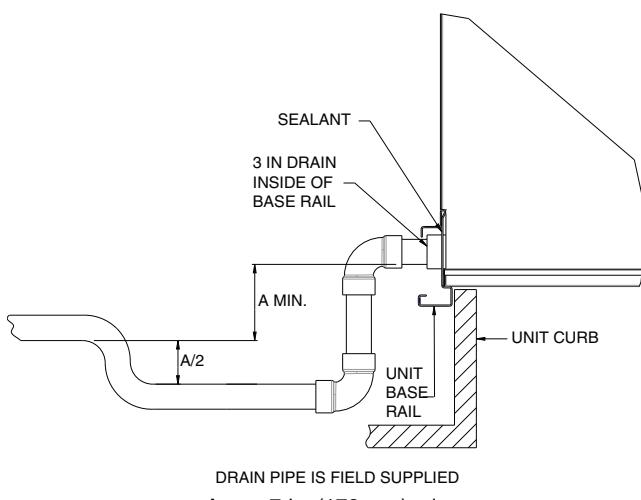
Condensate Drain Piping Details (Slab and Curb Mounted)
